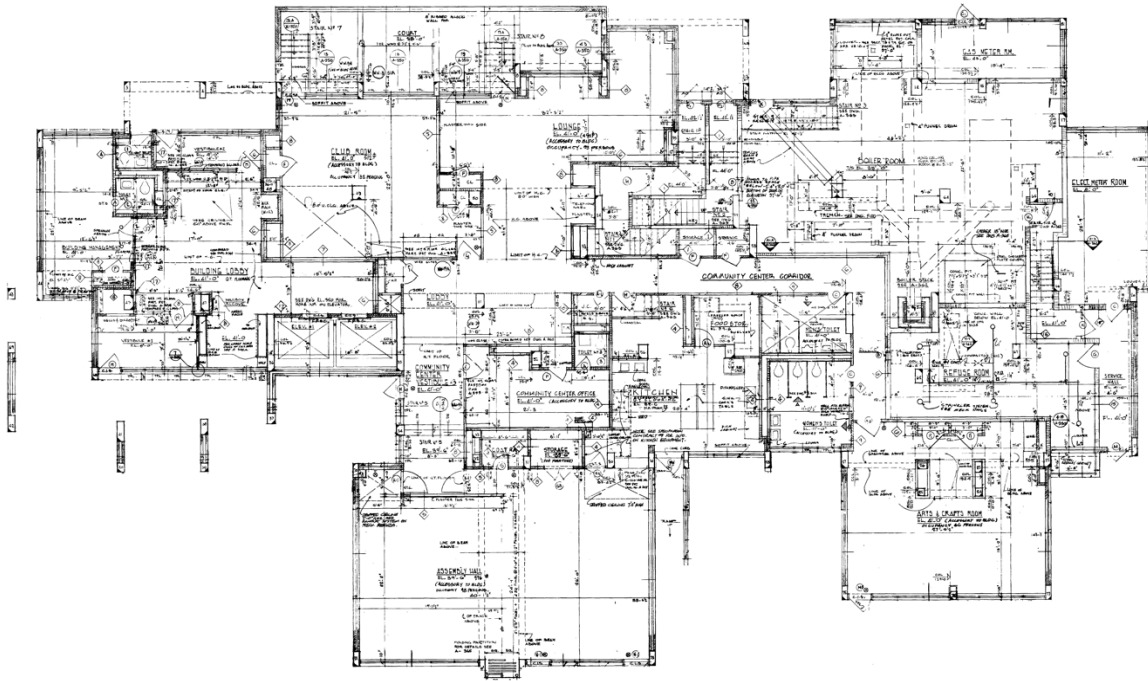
First floor plan, 1969. Note the entry portico at the southwest corner. (NYCHA)
